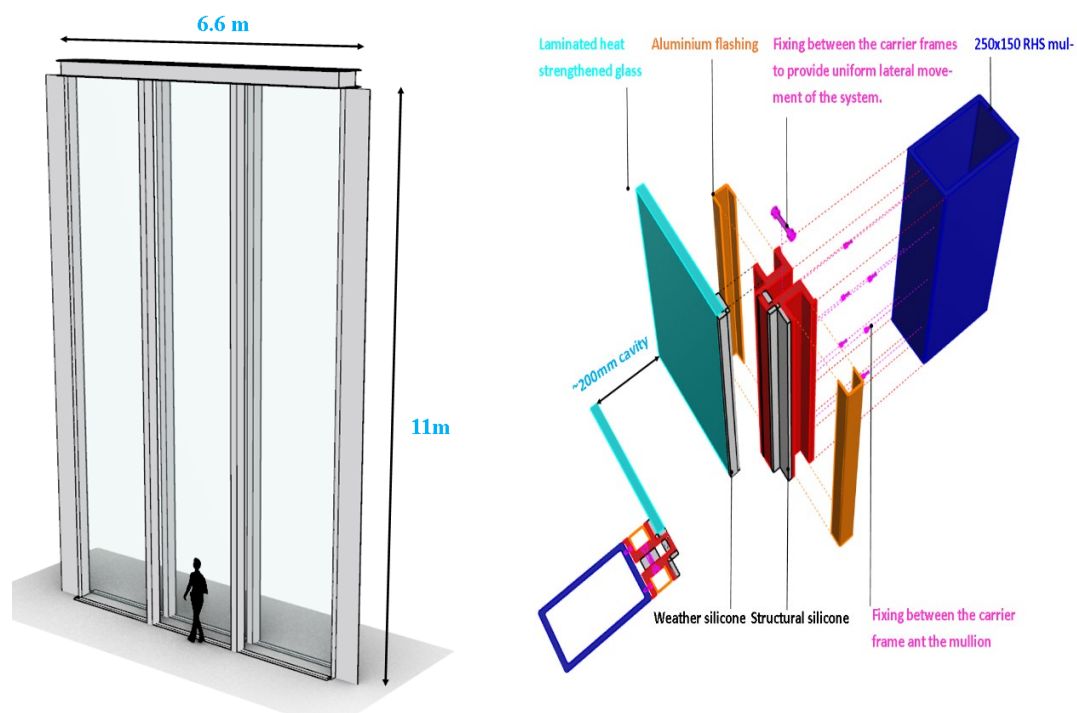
Left Feature glass wall concept, right exploded detail of the typical connection
